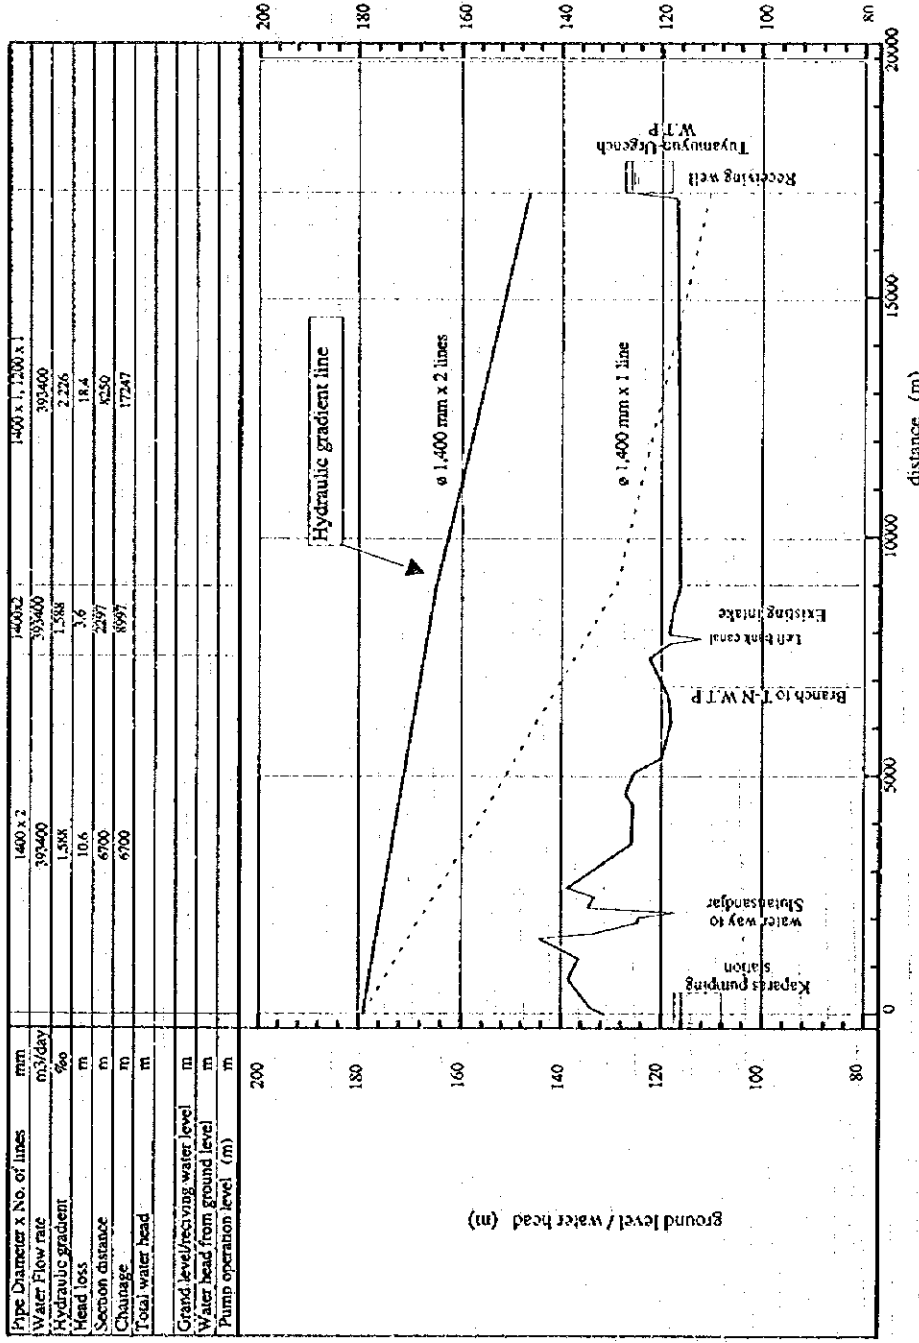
Longitudinal Section of Raw Water Main from Kaparas pump station to Tuyamuyun-Urgench W.T.P
